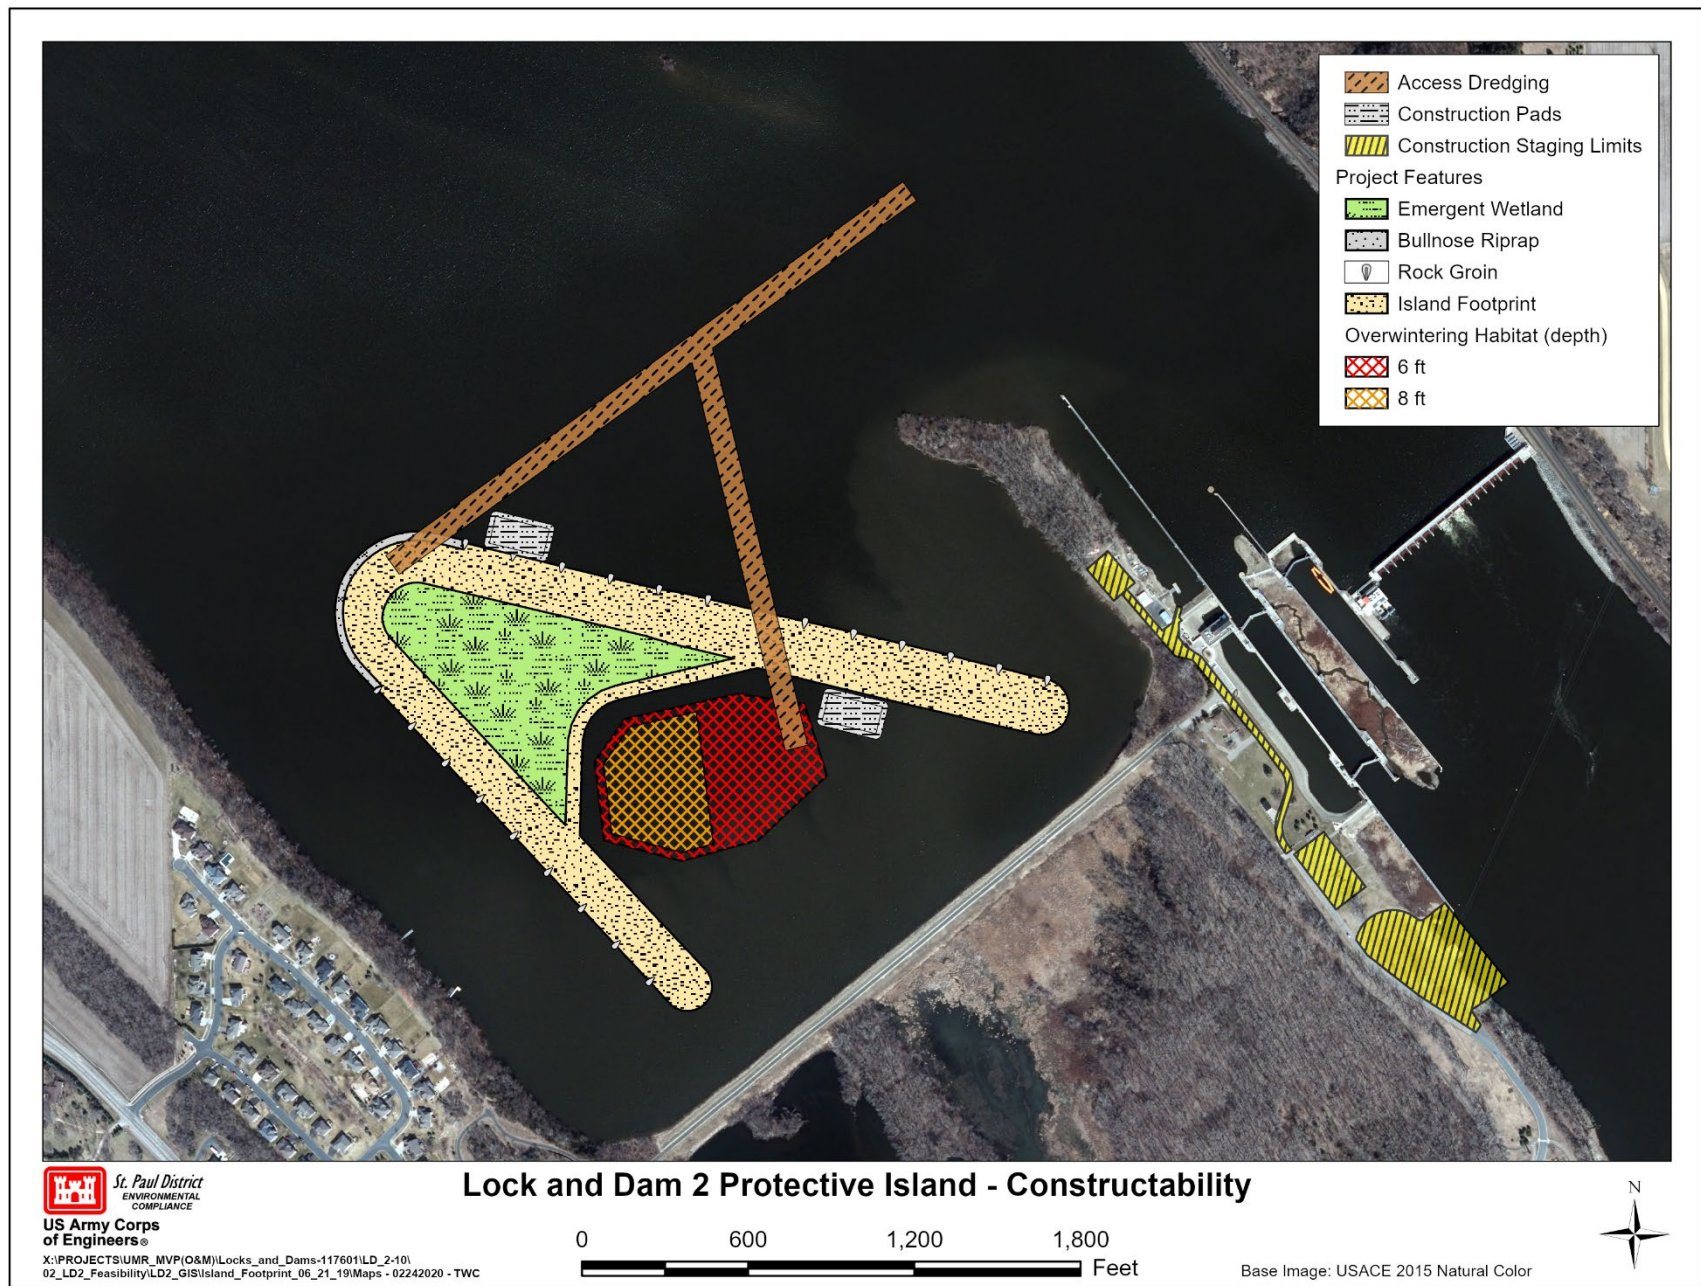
Lock and Dam 2 Protective Island Project constructability features.
